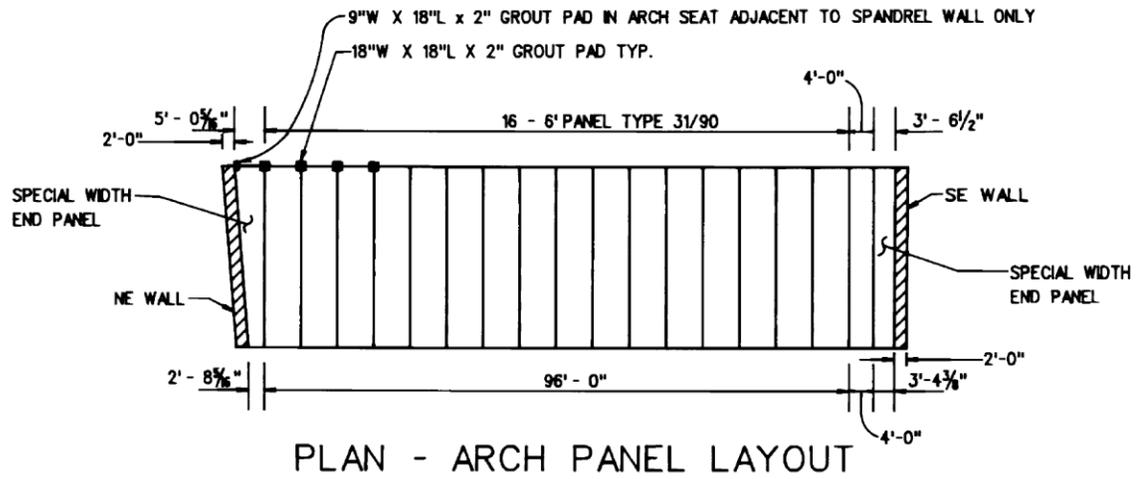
Cut-Out Plan View of Arch III Construction Plan (cp. Appendix I)
